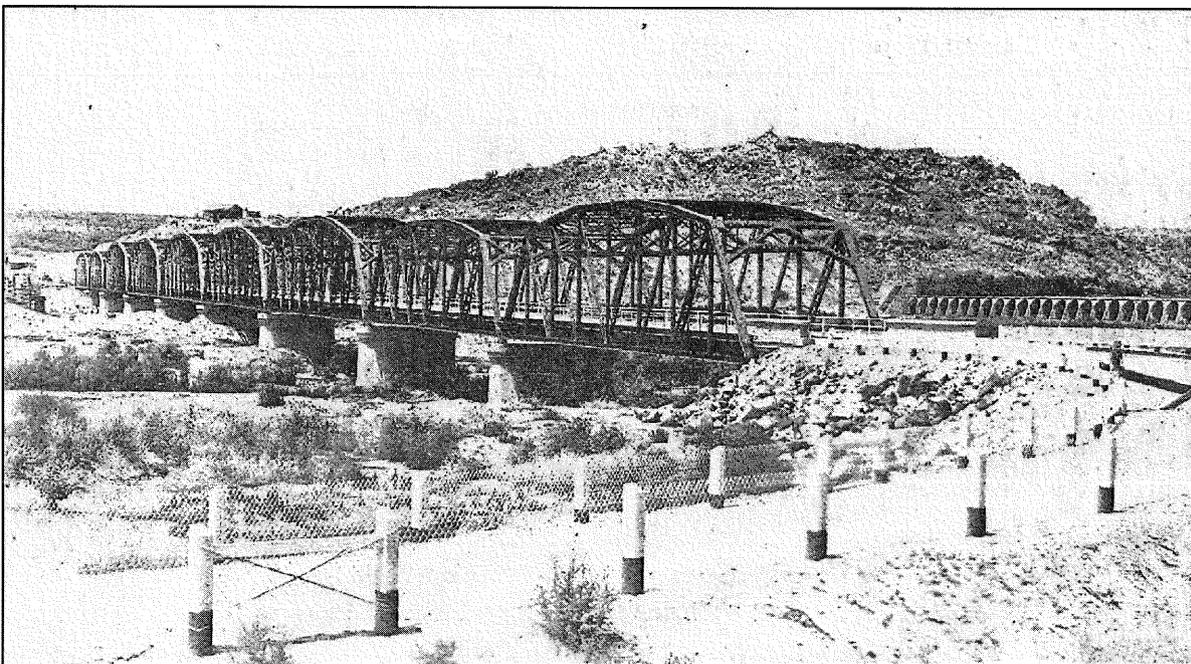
1928 photograph of completed and opened Gillespie Dam Bridge (Whitworth 1928).
